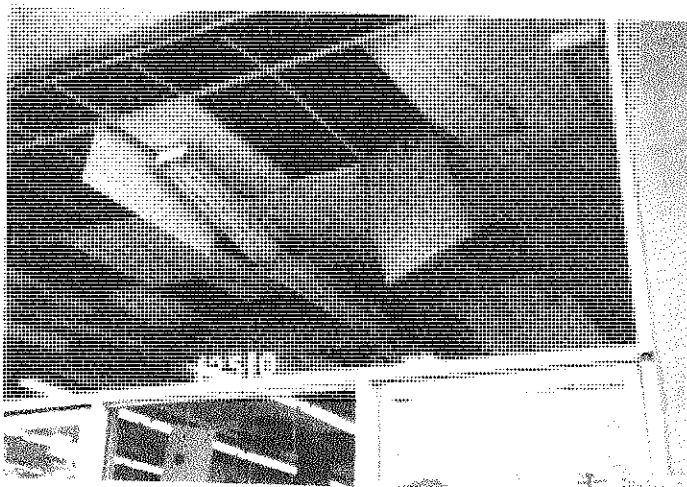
Damage to suspended ceiling system and light fixtures. Post Restricted Use and barricade the unsafe area.
